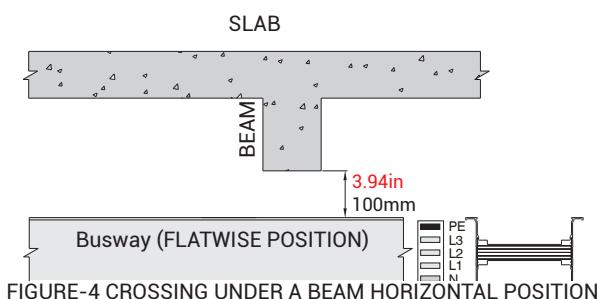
CROSSING UNDER A BEAM HORIZONTAL POSITION
